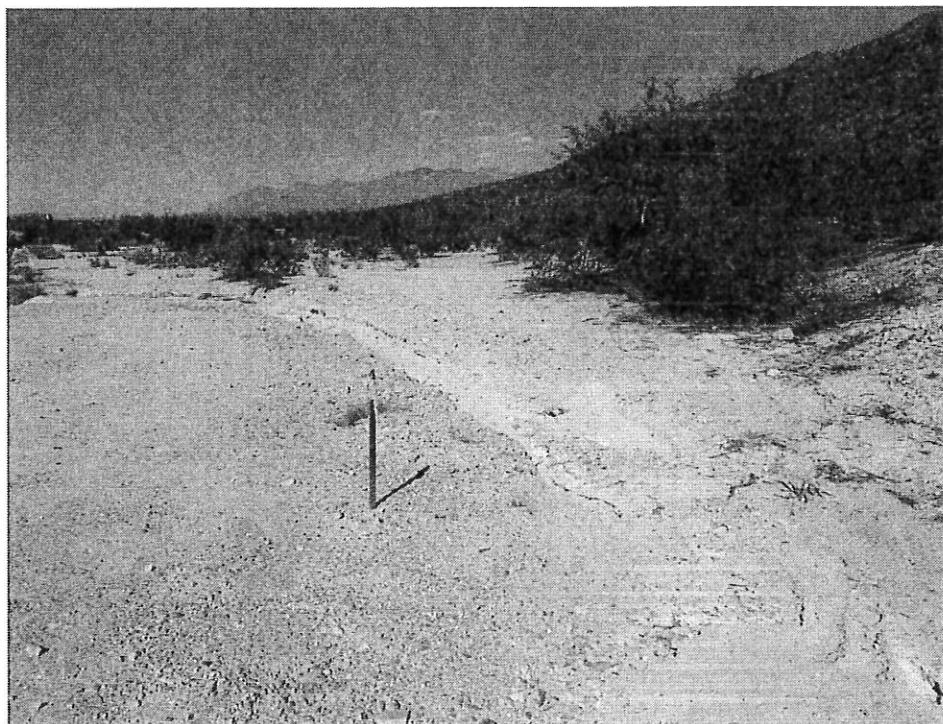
Eroded road connecting wells WR-385A and WR-385B with wells 448A and WR-448B
